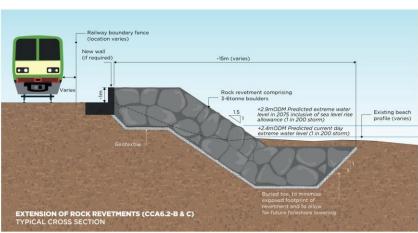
CCA6.2 Typical cross section showing rock revetmen
